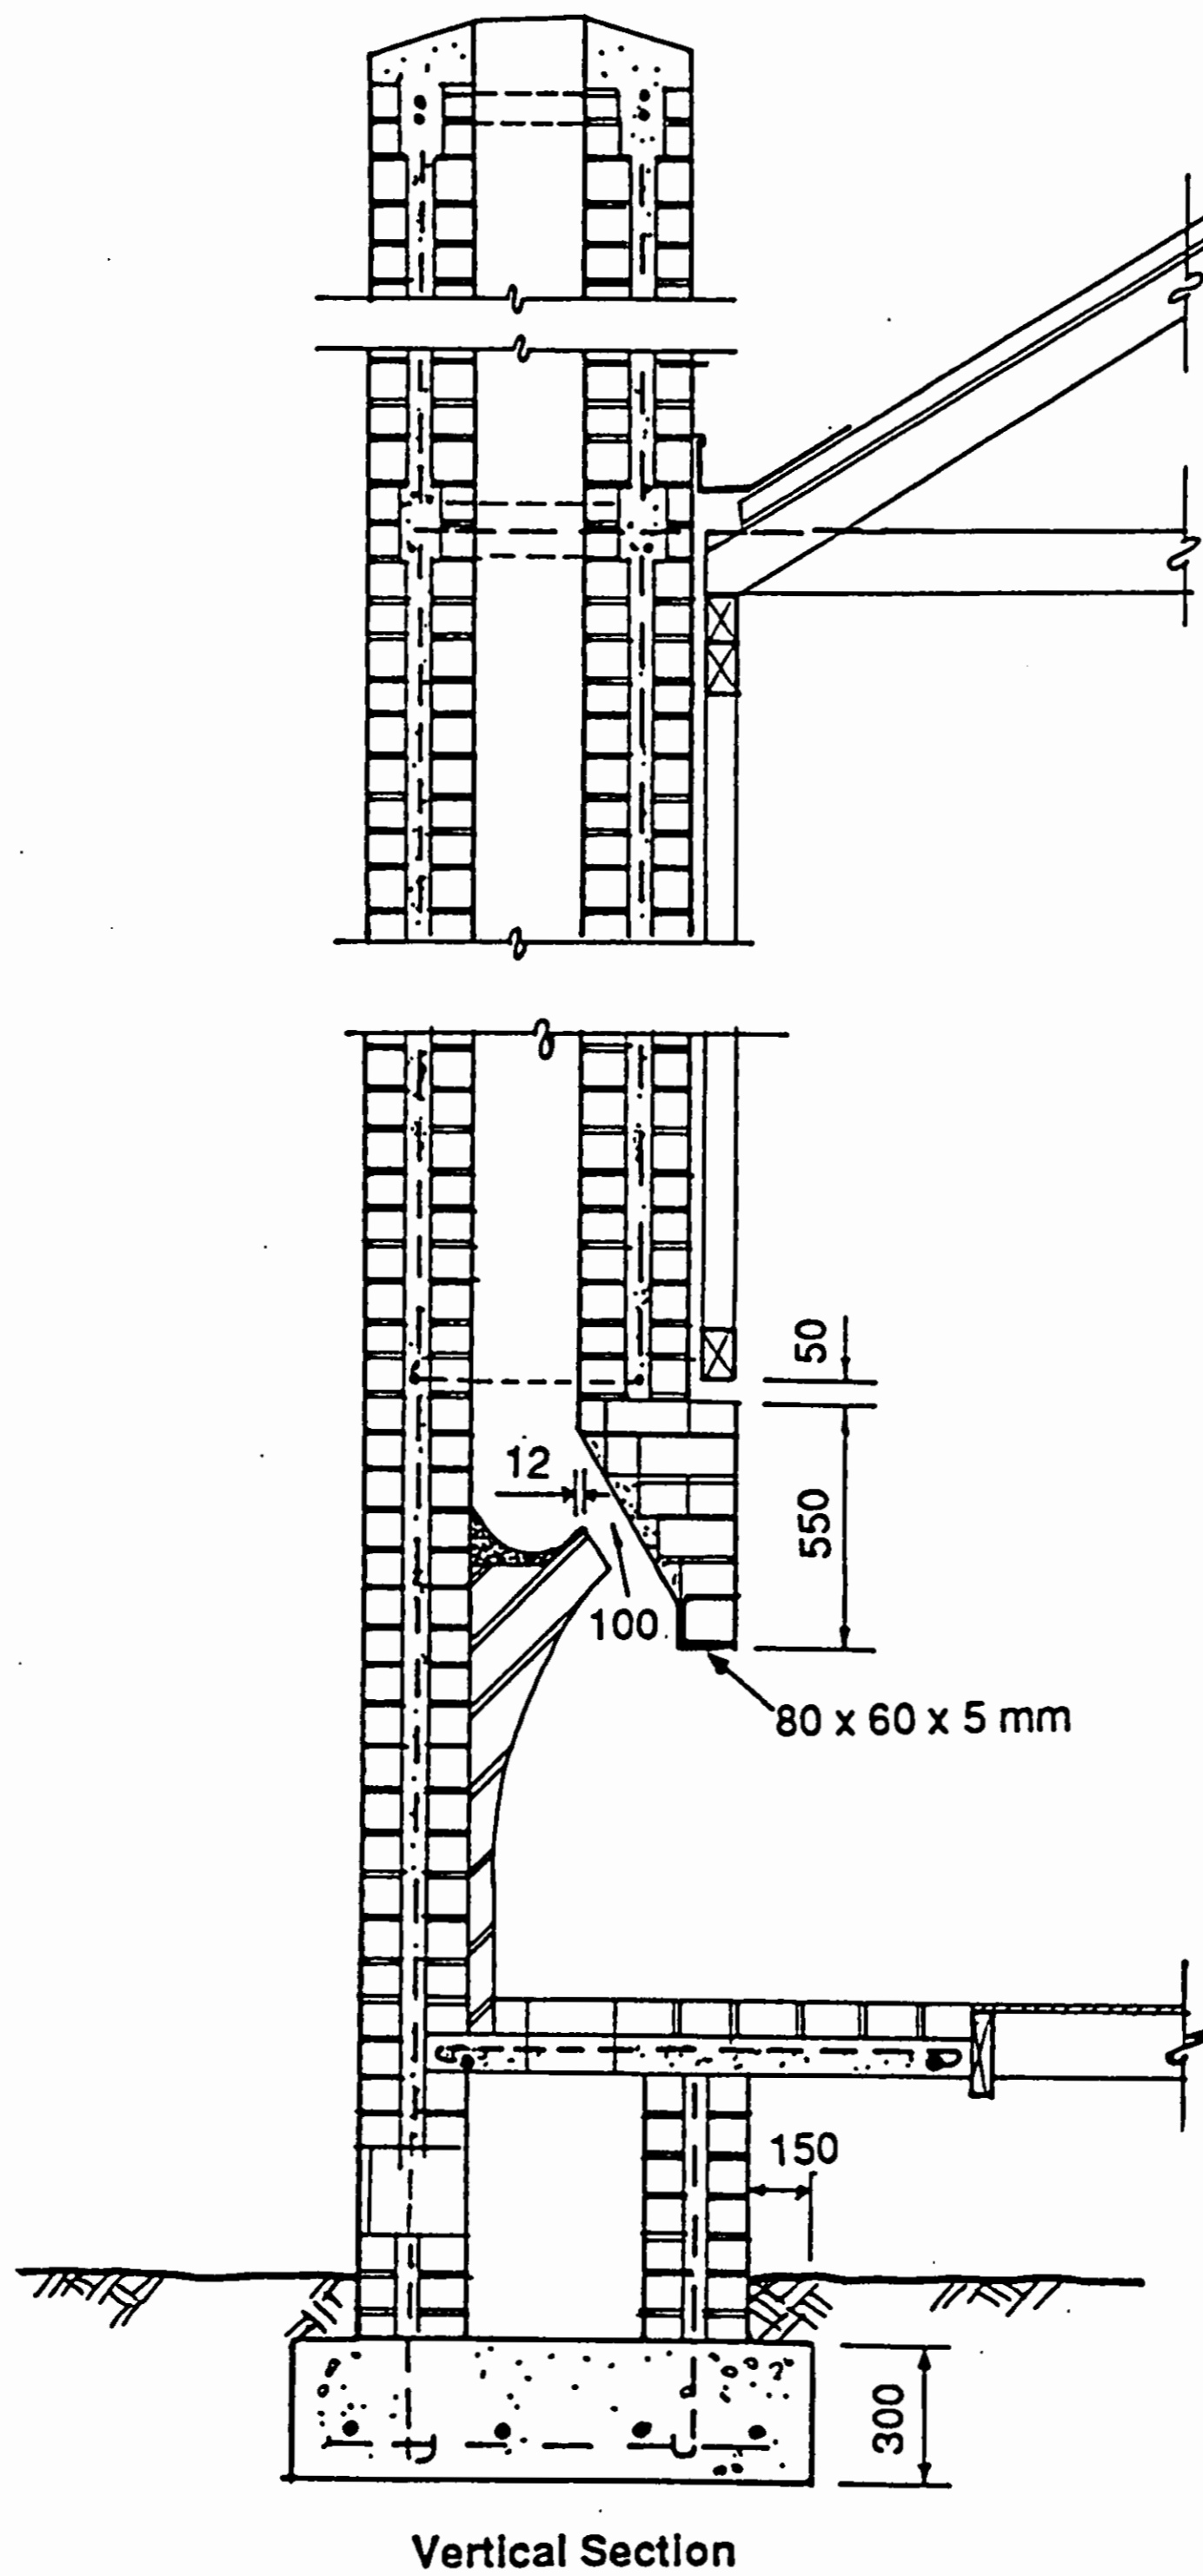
Reinforced brick chimney using half bricks/full bricks or half bricks on edge (PACRA, 1981)
